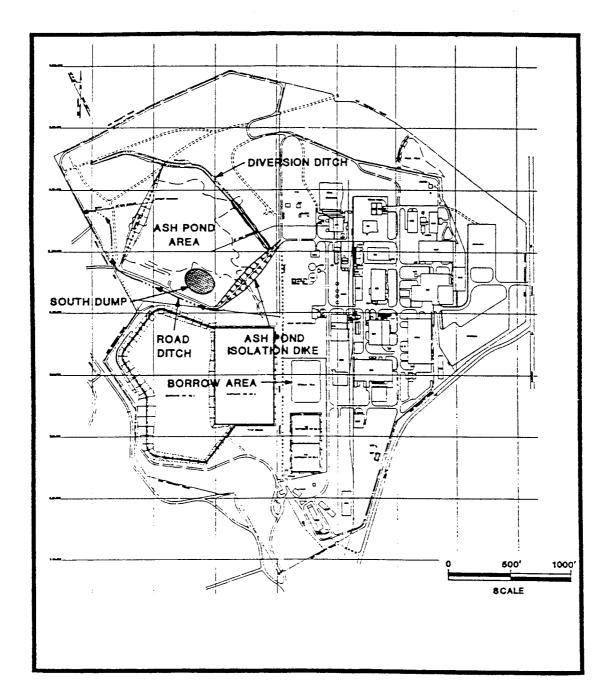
Location of Proposed Dike and Borrow Area (Source: Modified from MK-Ferguson and Jacobs Engineering 1987)
